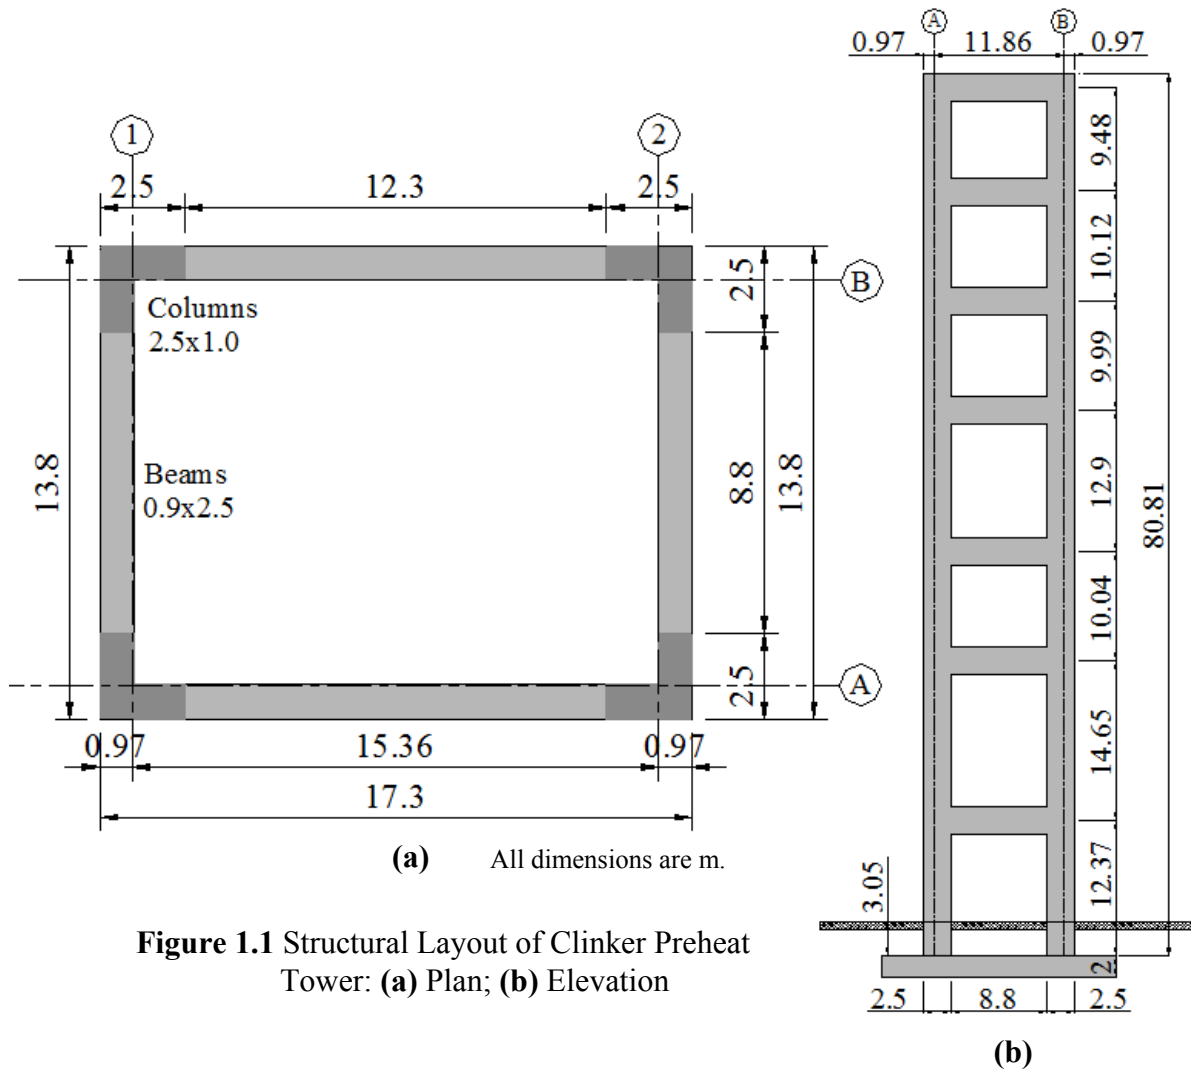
Structural Layout of Clinker Preheat Tower: (a) Plan; (b) Elevation
